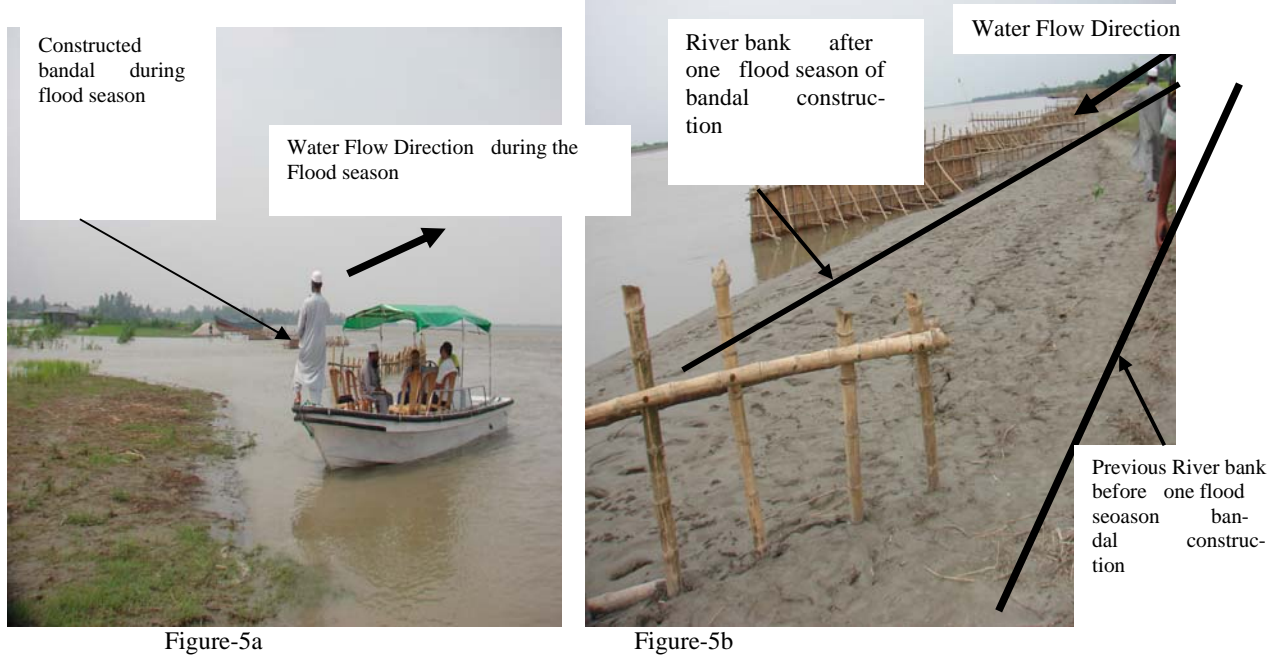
Stabilization of river bank with the aid bamboo bandalling structures
